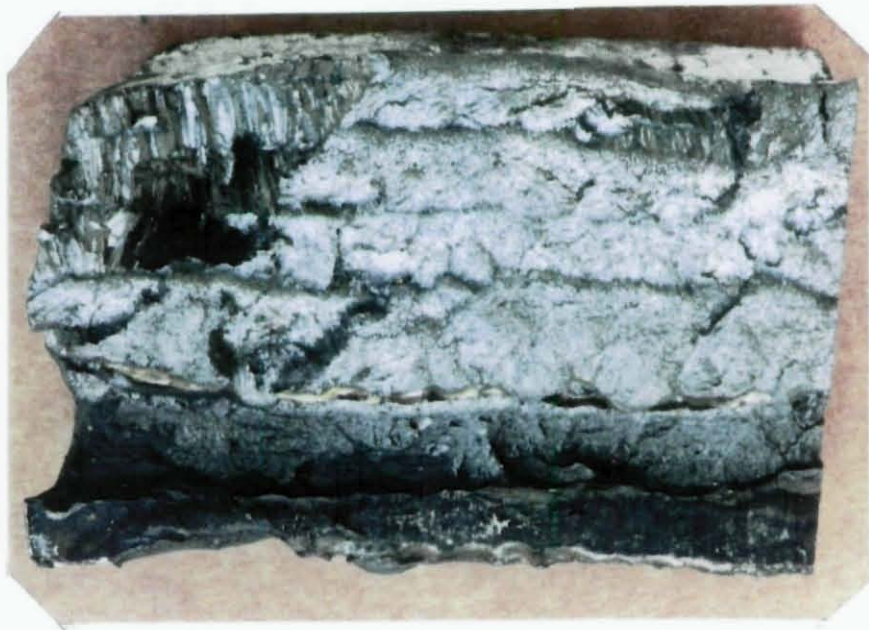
North piece from the beam-side fracture of the east-beam top-flange joint.
